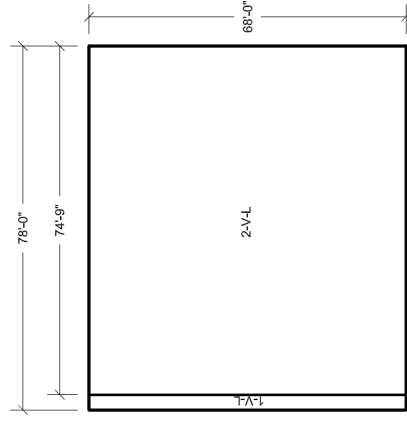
H.6-76: PUMP HOUSE INTERNAL WEST WALL LOOKING WEST
